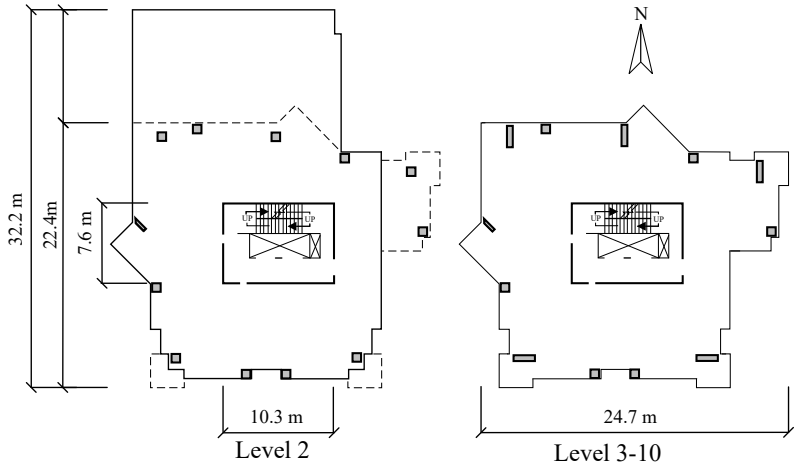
Level 2 (left) and level 3-10 (right) floor layout of the City Crest Tower.
